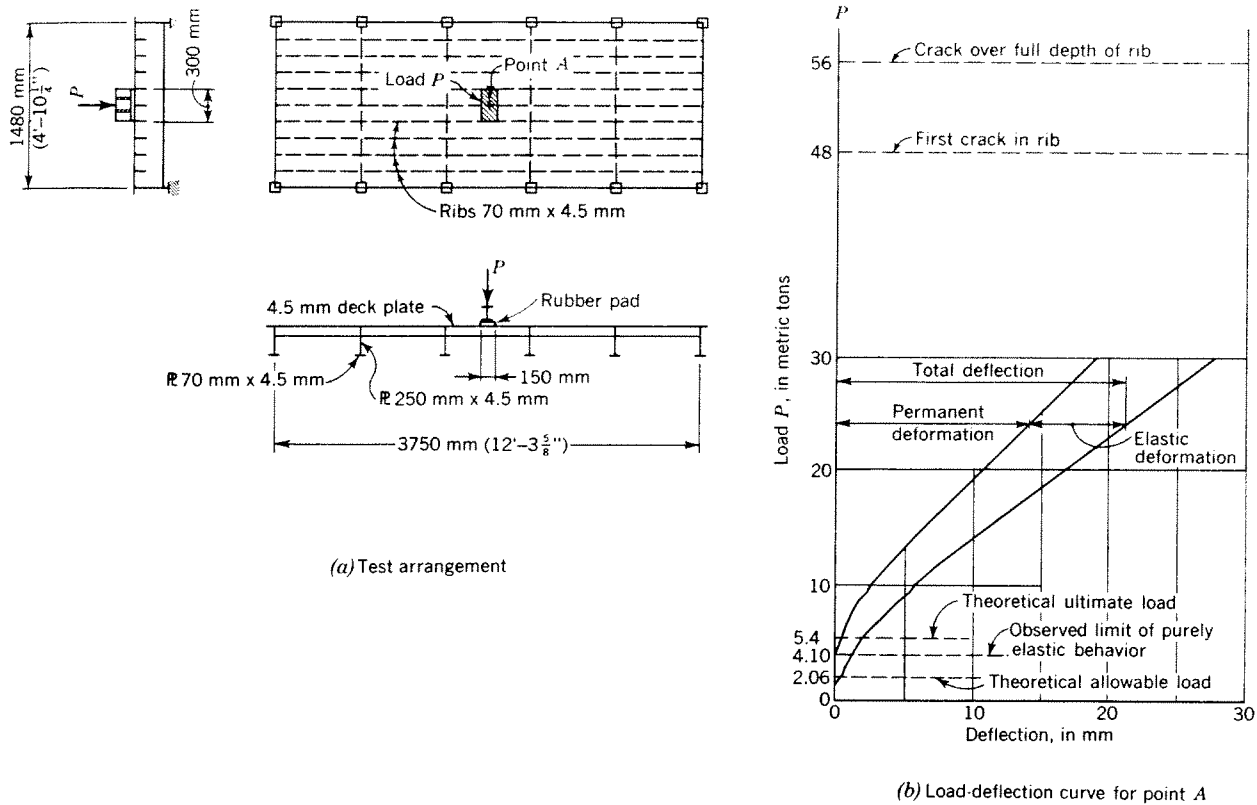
Load test on a half scale model of Save River Bridge deck plating
